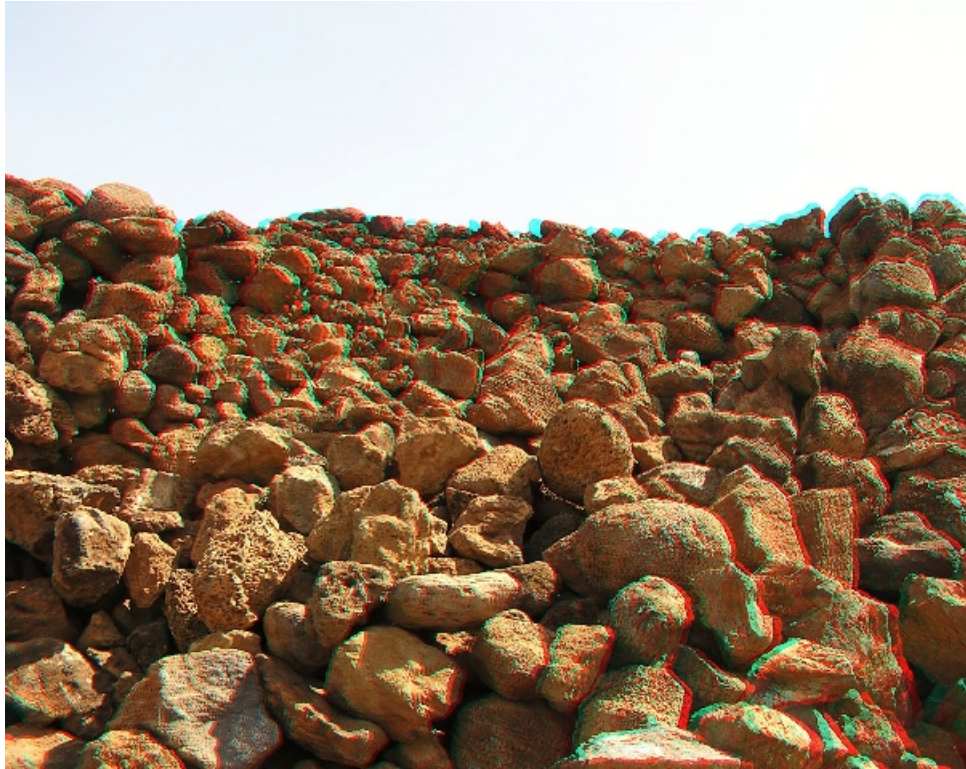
Location 29, slump failure in high rock wall of Pu'ukoholā heiau, west side.
